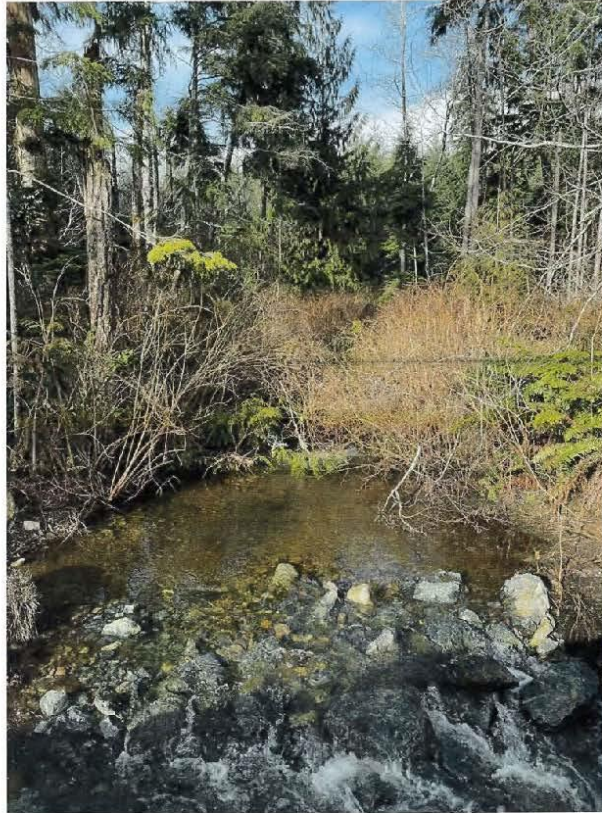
View of King Creek adjacent to Lot 14. Flow depth is roughly 0.3 m with a creek base of sand and gravel and with some rip-rap placed upstream of a culvert placed beneath proposed roadway 'A'.
